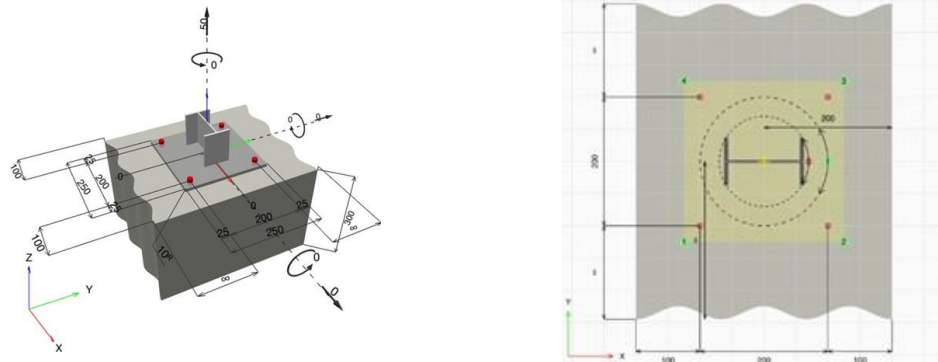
Baseplate connection using post-installed mechanical anchors
